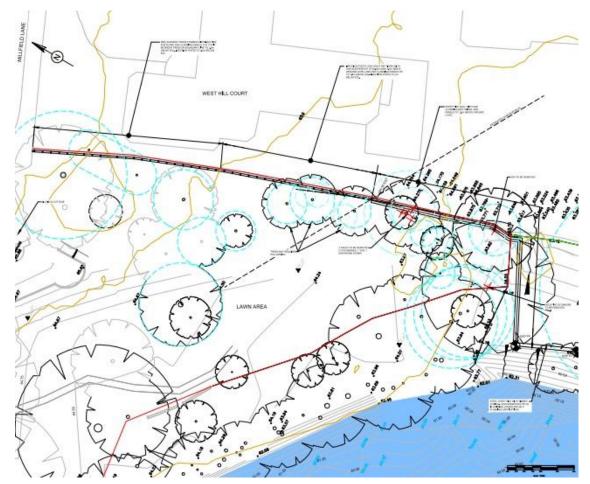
Highgate No. 1 Pond, G.A. Plan of Conjtainment Wall at Millfield Cottage, Detailed Plan (Atkins, drwg no. 5117039-ATK-P6-ZZ-DR-C-0010, 02.11.2015)
